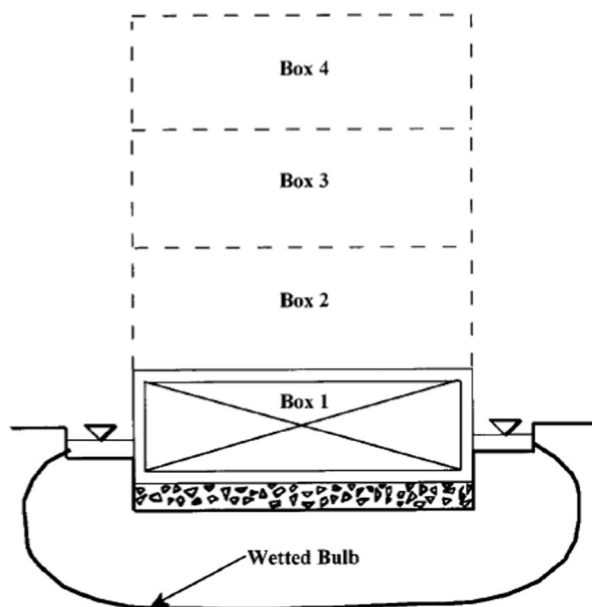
A plate load test for in-situ collapse potential (Houston 2001)
